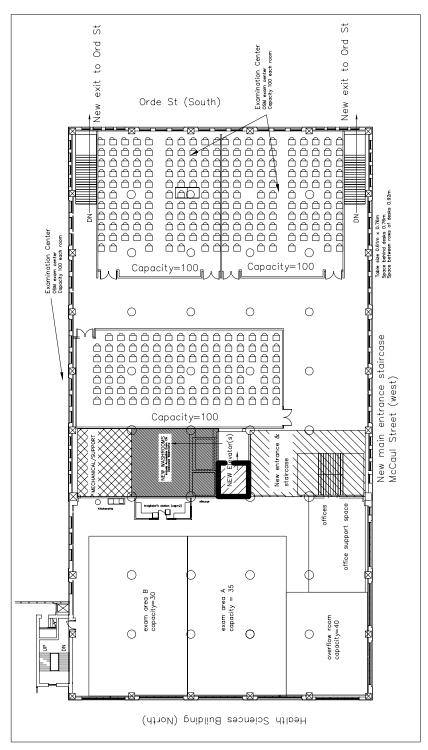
St. George Examination Centre – 255/257 McCaul Street – First floor
